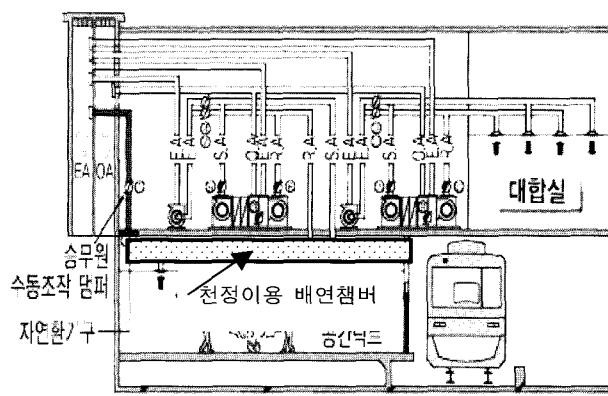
Concept drawing showing smoke chamber or ducts using ceiling area connection platform and tunnel
